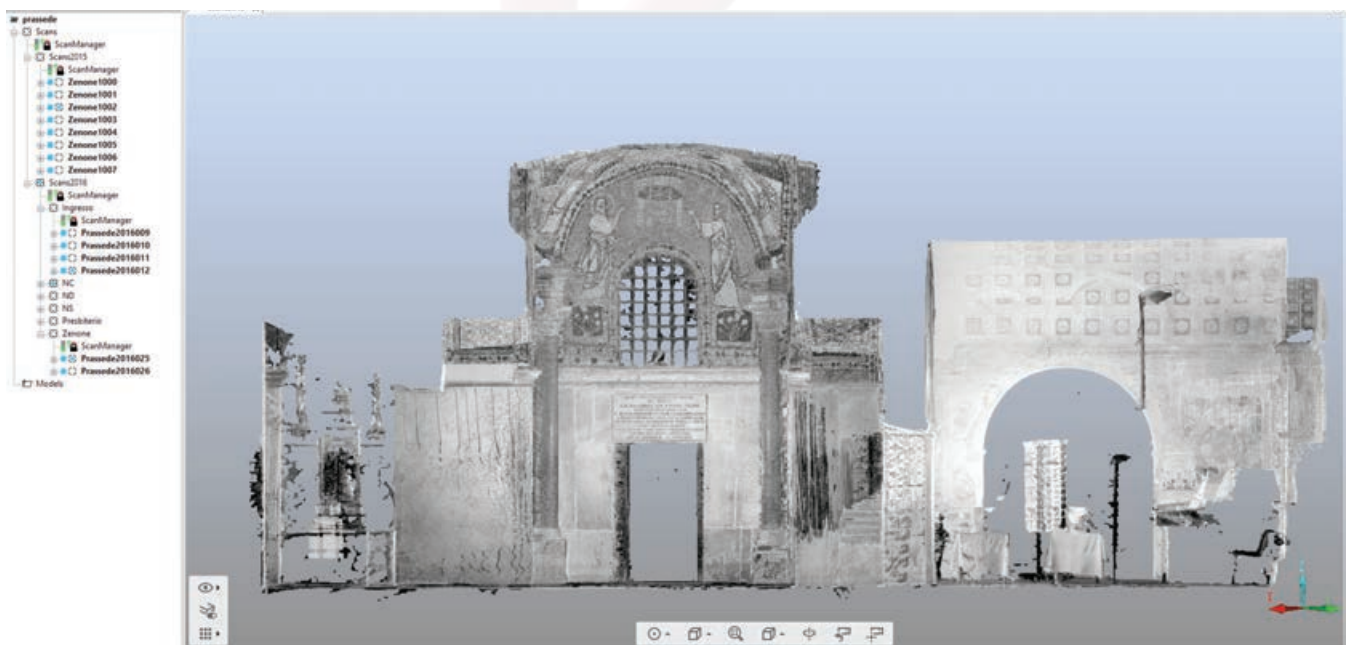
Rome, Santa Prassede, front entrance. Longitudinal section of the entrance staircase and courtyard.
